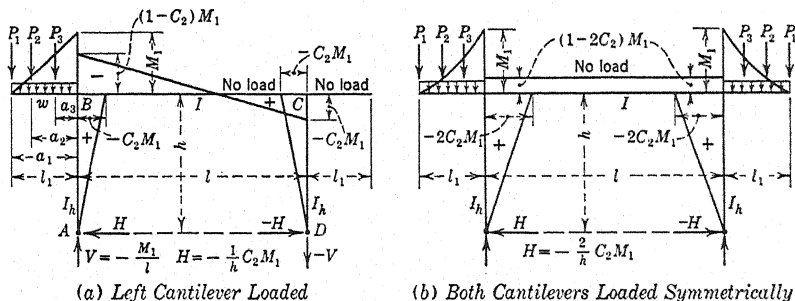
Right-angle Frame with Cantilevers, Hinged Ends. (See p. 278.)
